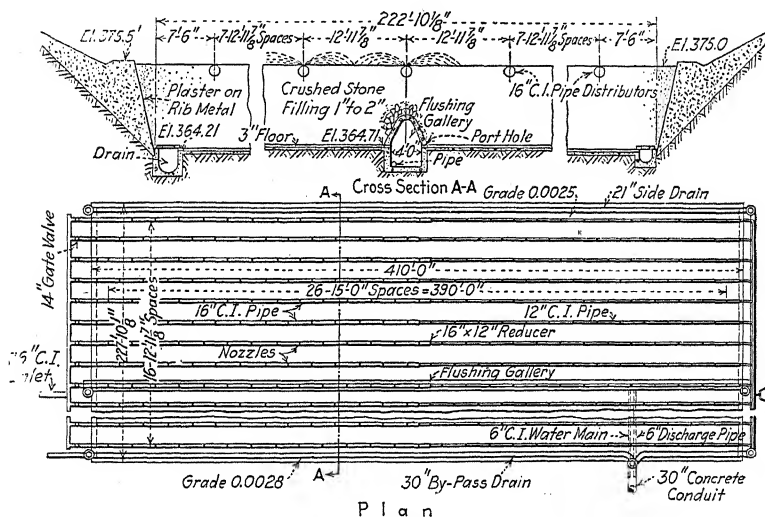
Arrangement of trickling filters, Fitchburg, Mass.
